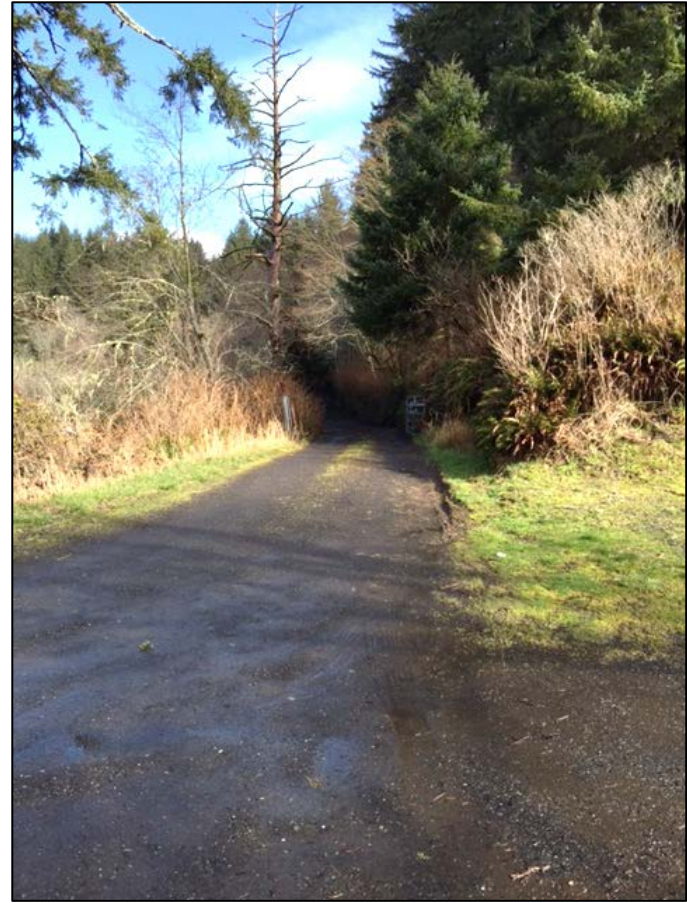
Proposed raw water pipeline and backwash line route under private driveway. Photo from North Beaver Creek Rd toward water treatment plant site.
